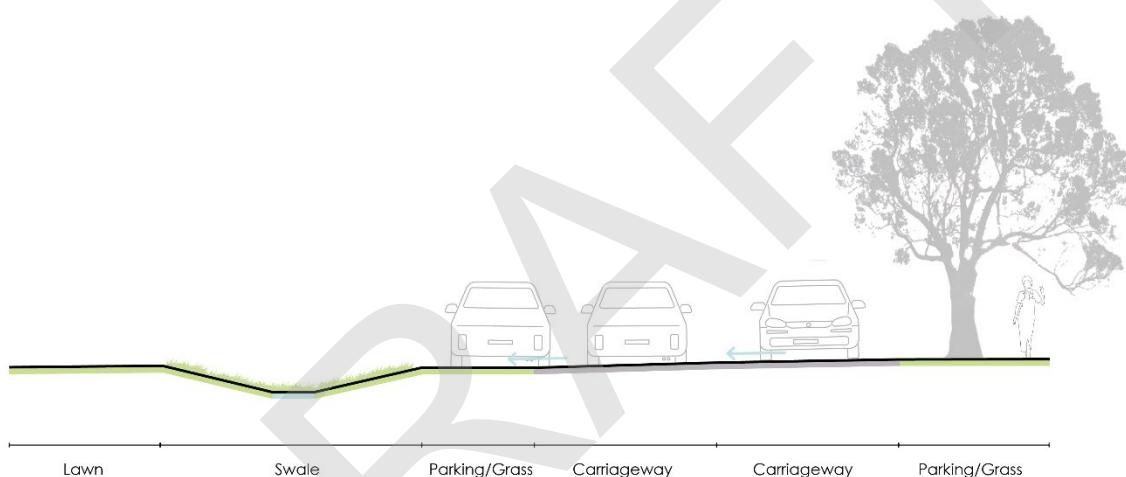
Potential roadside swale for stormwater conveyance and to encourage soakage.
